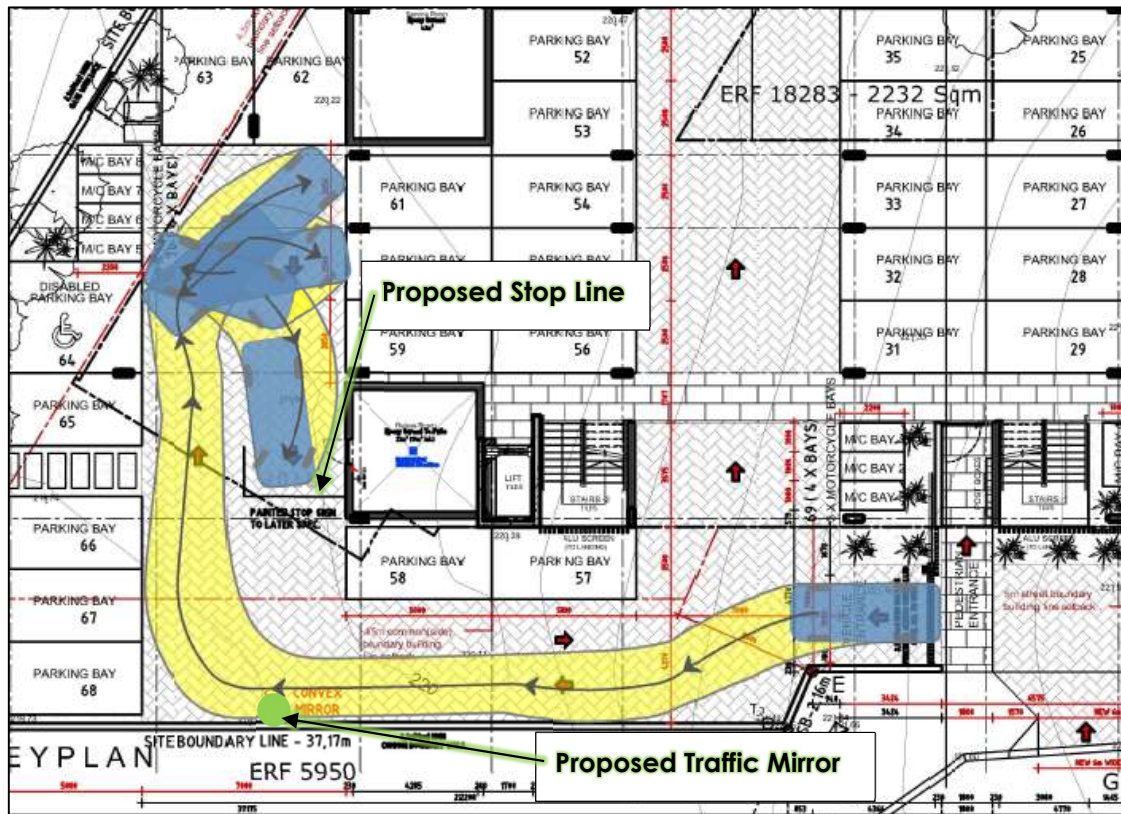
AutoTURN – Parking aisles (two-way section entering)
